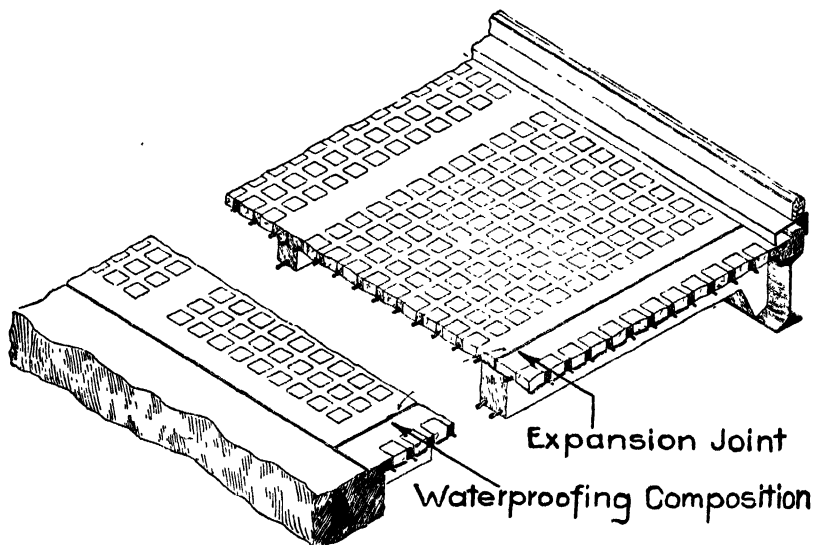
Typical Vault Light Construction. (See p. 808.)
